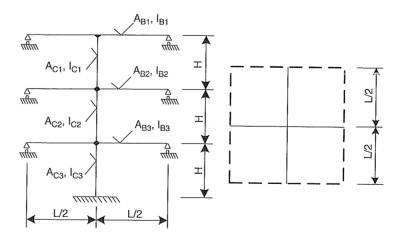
The investigated frame consisting of a column and 4 beams in each storey. The frame is a central part of a building as it is seen in the top view.
